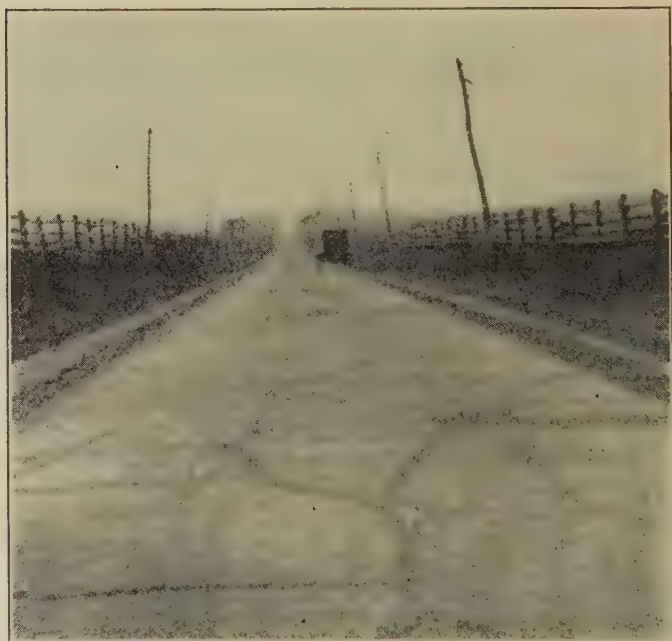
TYPICAL CRACKING OF CONCRETE PAVEMENT FROM POOR CURING.
